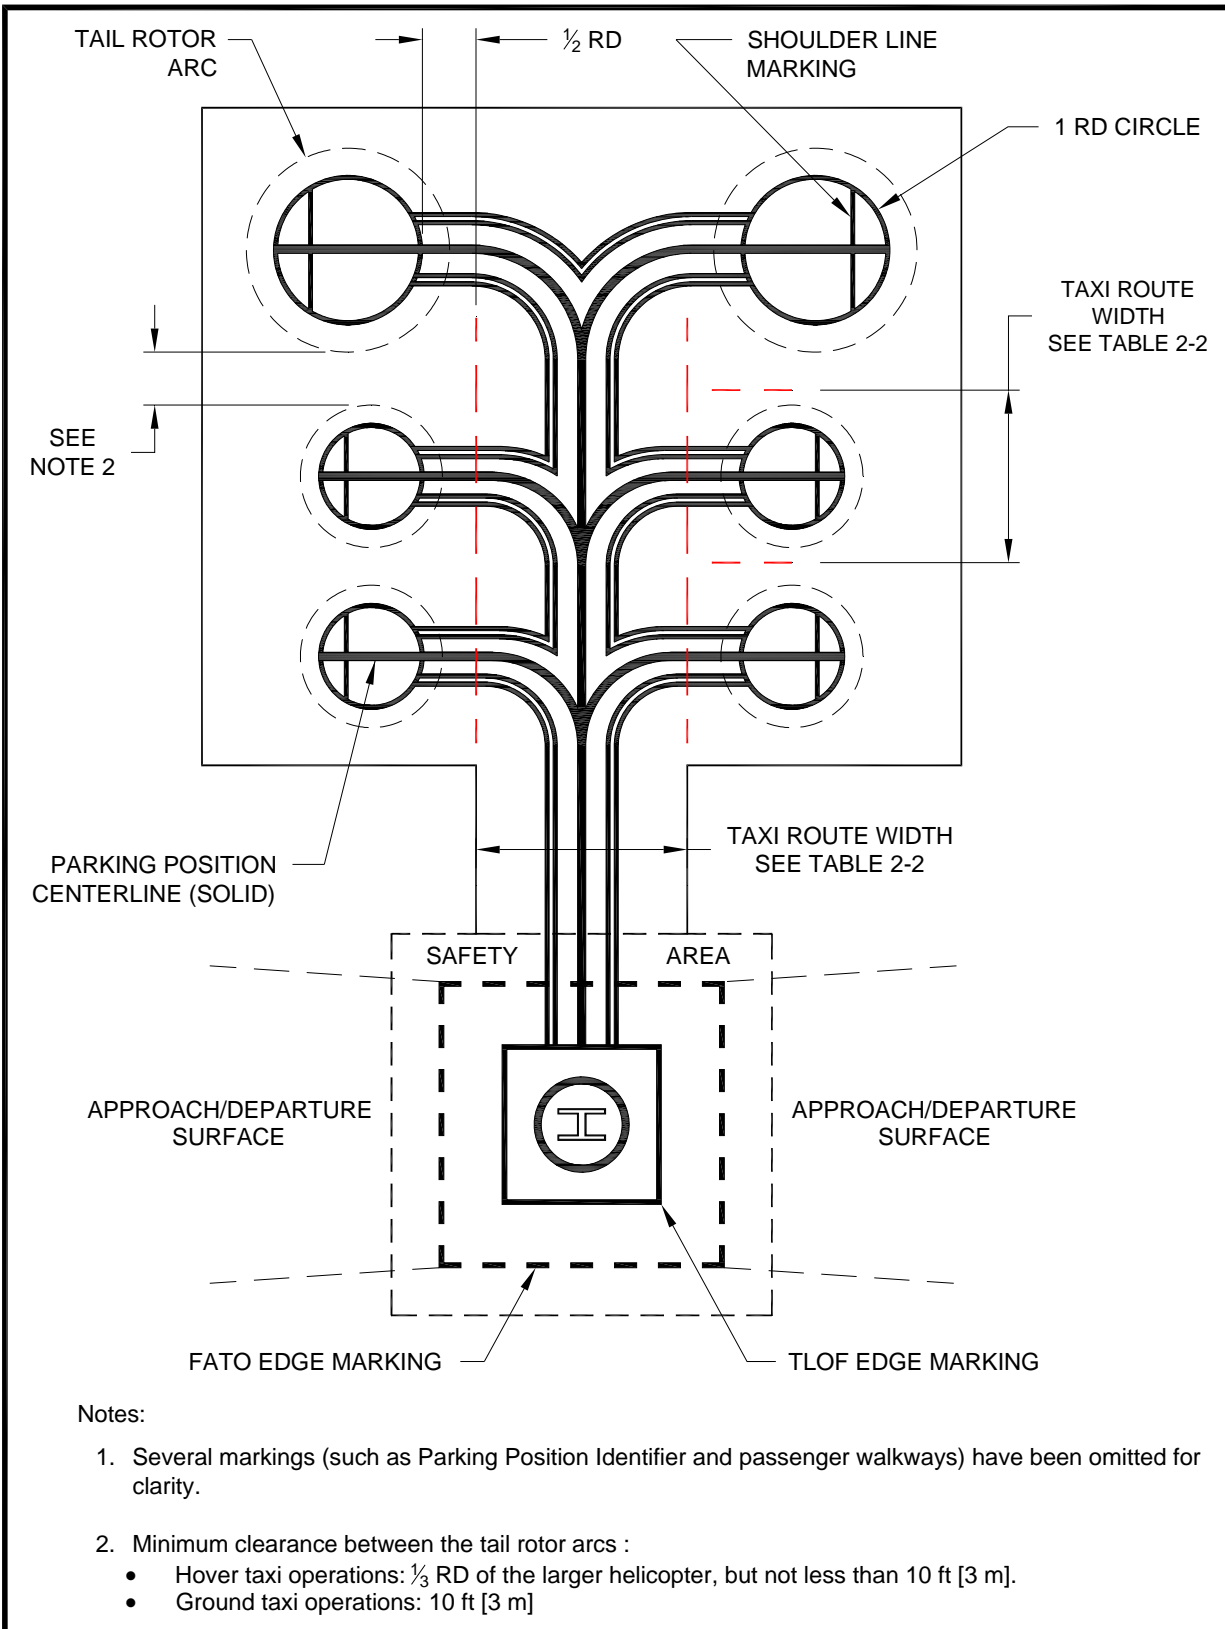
Parking Area Design – “Back-out” Parking Positions: General Aviation
